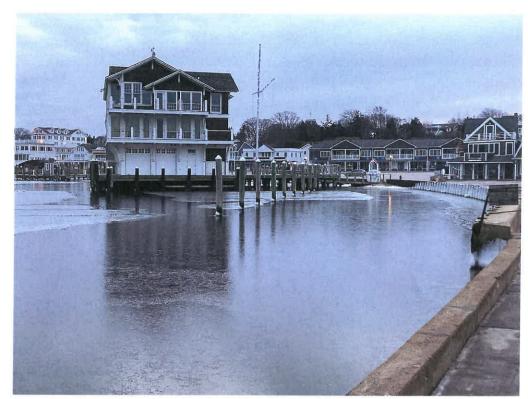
West Side of Watch Hill Yacht Club in Area of Proposed Dredging.
